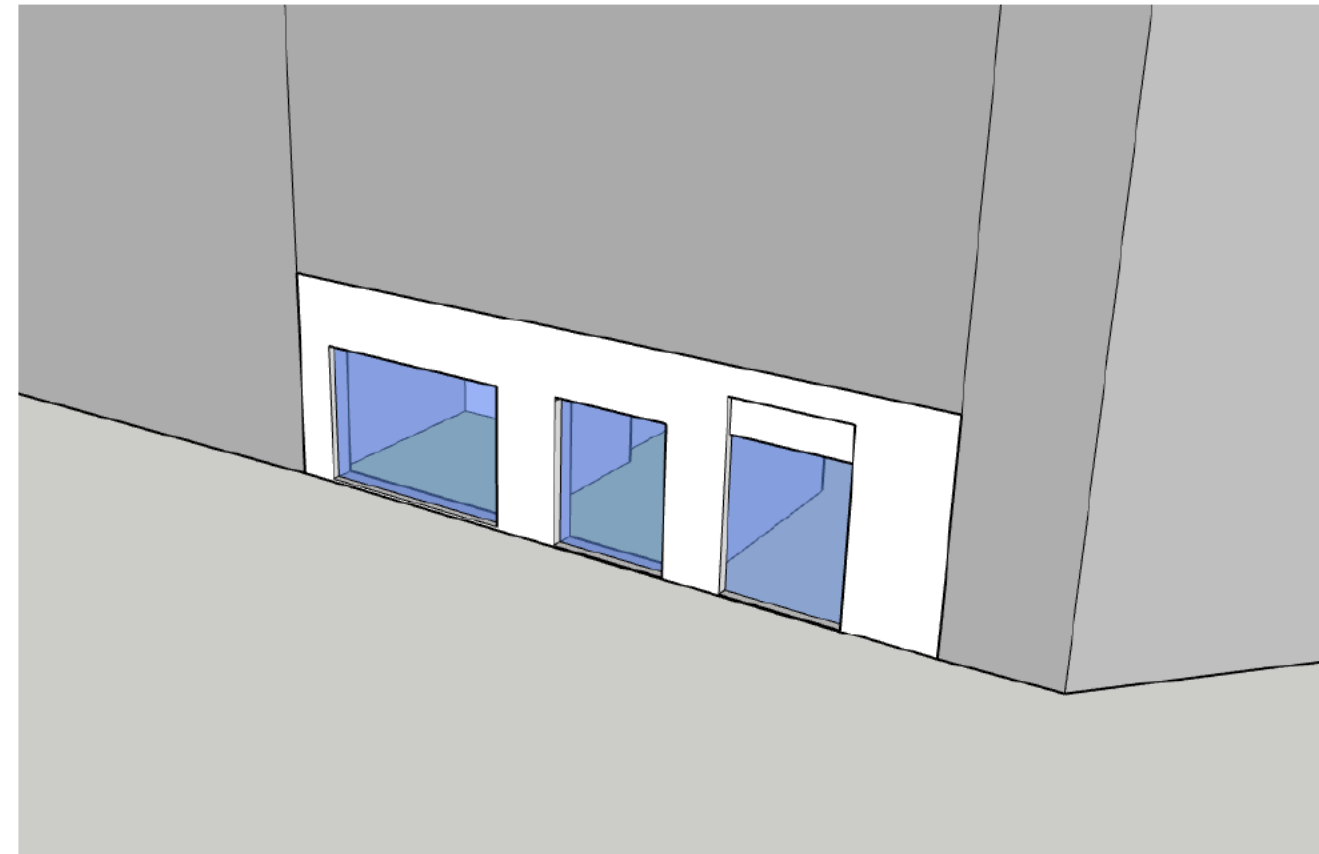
Street Level View of The Daylight Model of The Proposed Development (White) and Adjacent Buildings (Grey)
